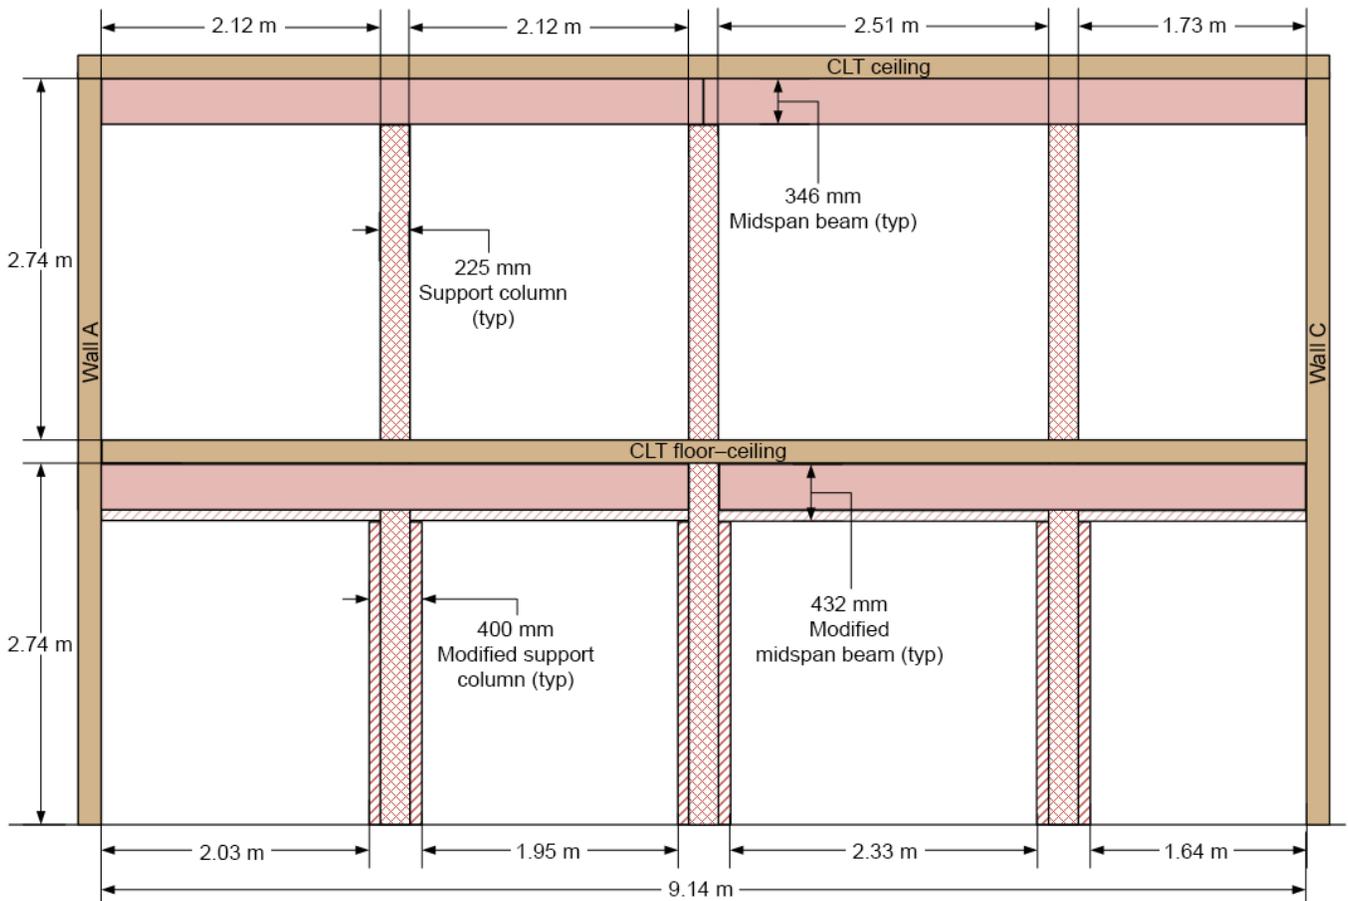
Cross-sectional view of apartment showing locations of support columns.
